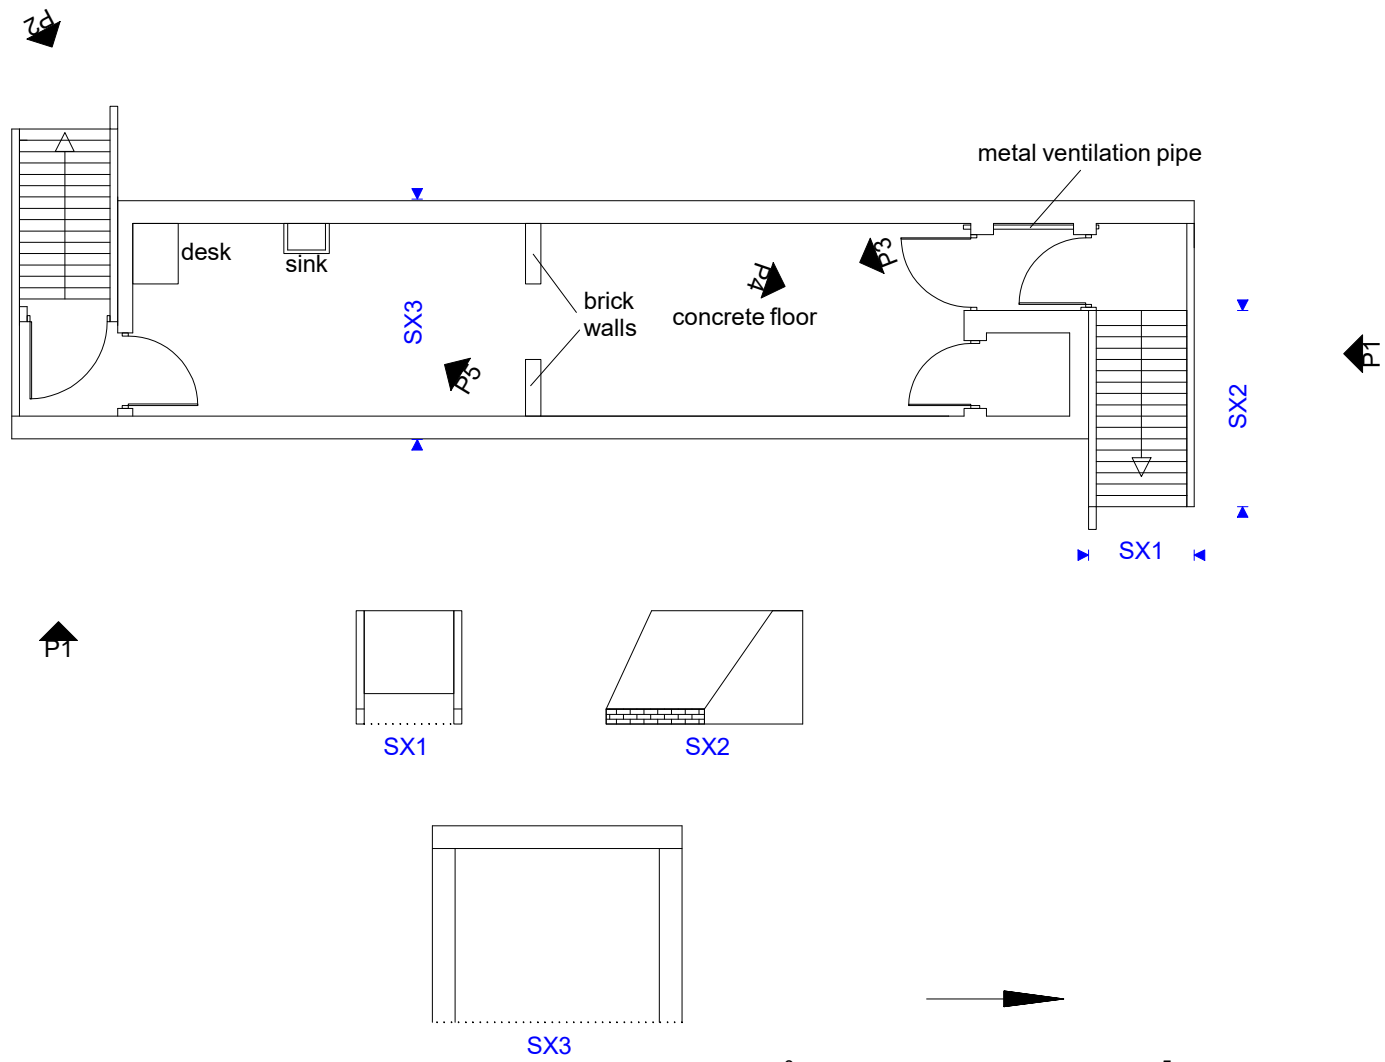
Floor plan and elevations of air-raid shelter. Location and direction of photographs reproduced in text shown.
